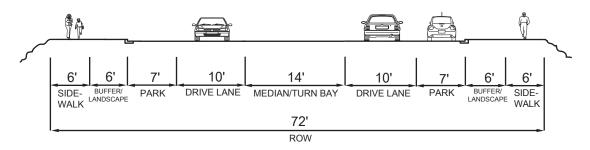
STREET TYPE 2.2: NEIGHBORHOOD STREET B
